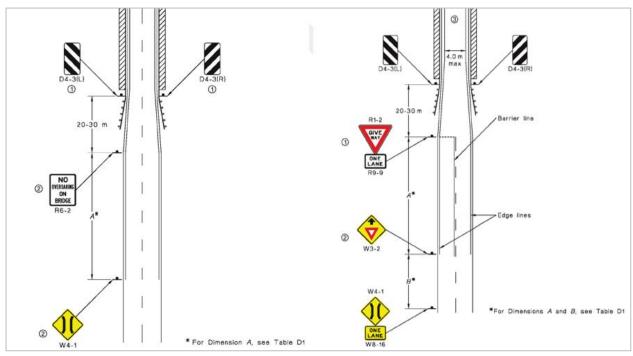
AS1742.2 Narrow Bridge and One-way with Giveway Treatments
